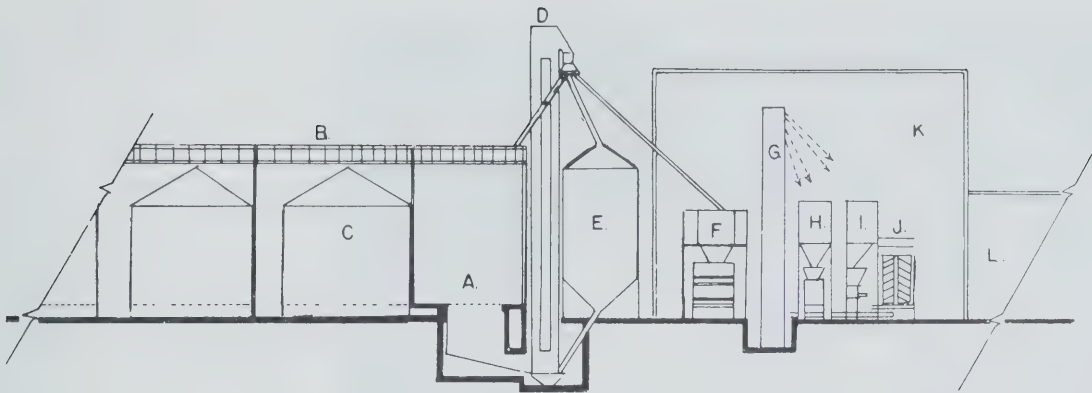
Side elevation (nonscaled) of a typical soybean seed facility. A, receiving area and dump pit; B, drag flight conveyor for loading bins; C, aeration-bulk storage bin; D, main receiving elevator; E, holding bin; F, surge bin and air screen cleaner; G, four-way continuous bucket elevator; H, surge bin and treater; I, surge bin and bagger-weigher; J, spiral separators; K, processing building; L, bagged seed storage building.
